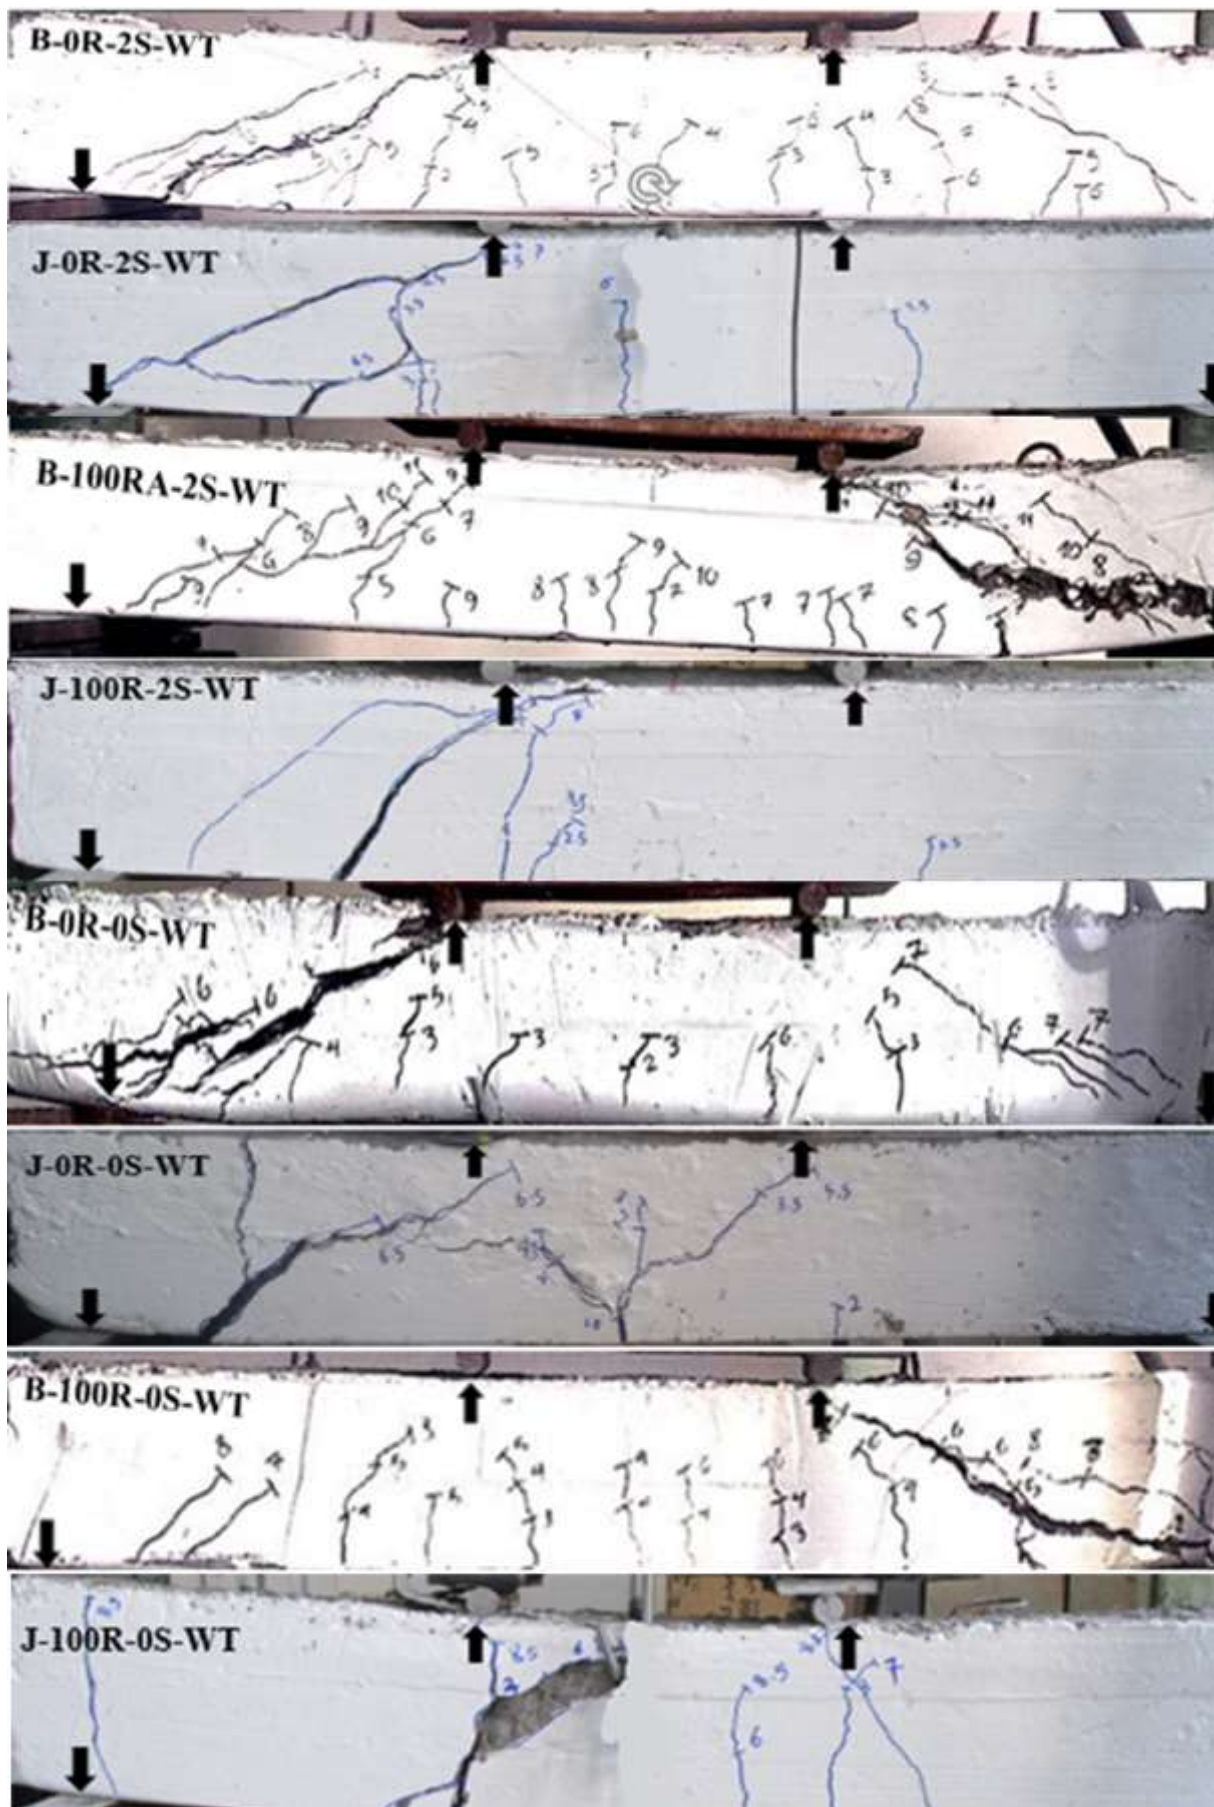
Failure in specimens with no shear reinforcement and cracks propagation during loading
